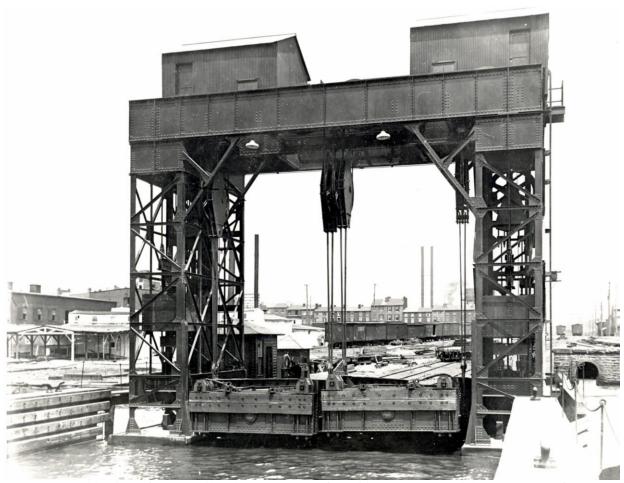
Waterside view of B&O Railroad's Canton Transfer Bridge, ca. 1914, which was accessed from the intersection of S. Clinton St. and Third Street, today's Danville Avenue. It was similar in design to the Philadelphia, Baltimore, Washington railroad transfer bridge. (B&O photo, John Teichmoller collection; reproduced in the Written Historical and Descriptive Data for the Baltimore & Ohio Railroad, Locust Point Transfer Bridges, 1055 Hull Street, Baltimore, Baltimore (Independent City), MD, HAER MD-180, Historic American Engineering Record (HAER), Library of Congress. Accessible here: https://www.loc.gov/pictures/collection/hh/item/md1932/)
